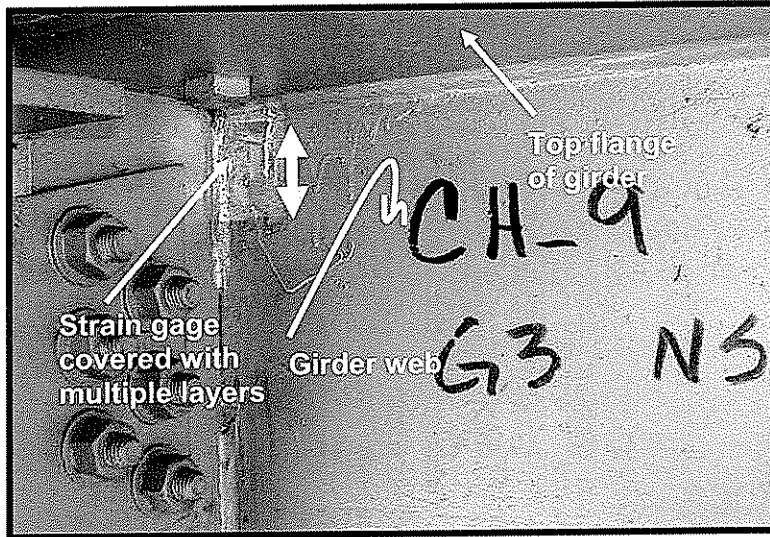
CH_9 installed in span 1 at P.P. 5 on the web of girder G3 adjacent to the weld toe of the transverse connection plate.
